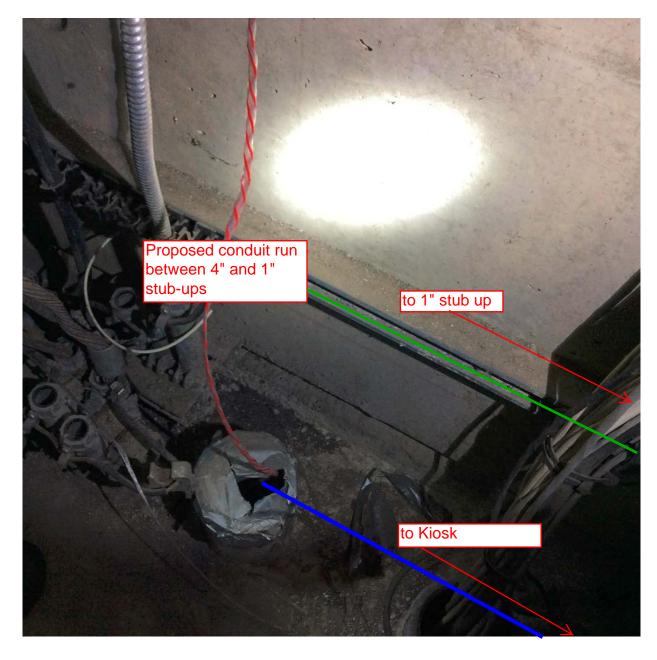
B35 New York Ave South: 1 inch stub up starting run to AFC Panel
